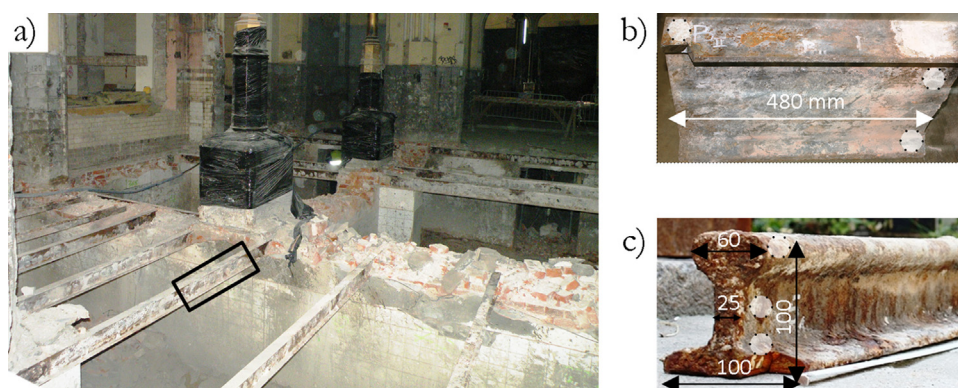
(a) Places of the material cutting from steel structure of the main hall – marked with the black frame – (B-material), (b) general view of the B-beam I220 with the main dimension in rolling direction, (c) the rail-shaped beam (RS-steel) with dimensions (in mm) – total length $L = 1200$ mm.
